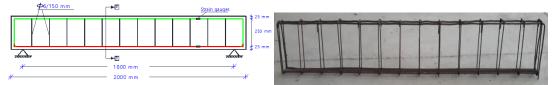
Detailing of reinforcement steel for control beam (B1) without opening (solid beam).
